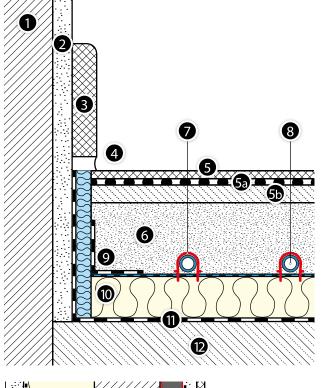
Floor heater with KAN-therm TBS system board and supplementary insulation and dampproof coating on the ceiling laid out on the ground.
